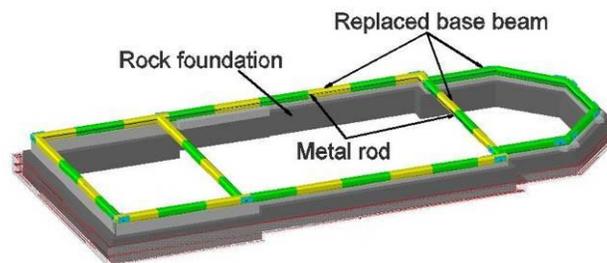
The consolidation solution of the foundation and of the base beam of the church
